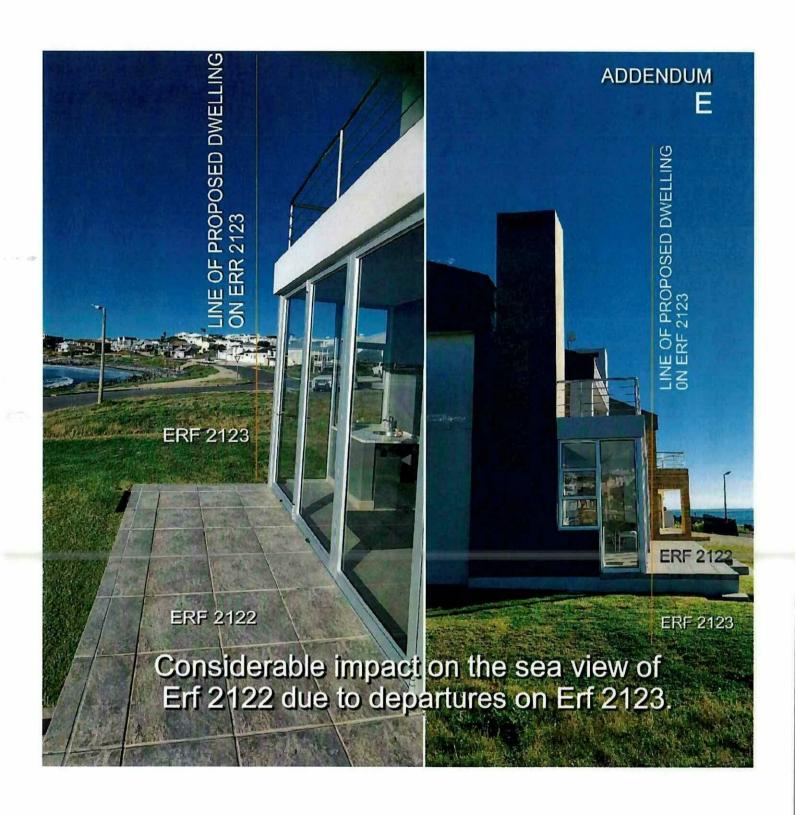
Relaxation of northern building lines Section 12.2.1 Encroachment of building lines:
